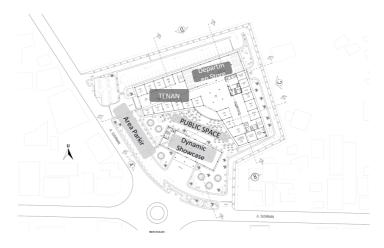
Shopping Center Building Site Plan Source: Personal Documents, 2021, processed
